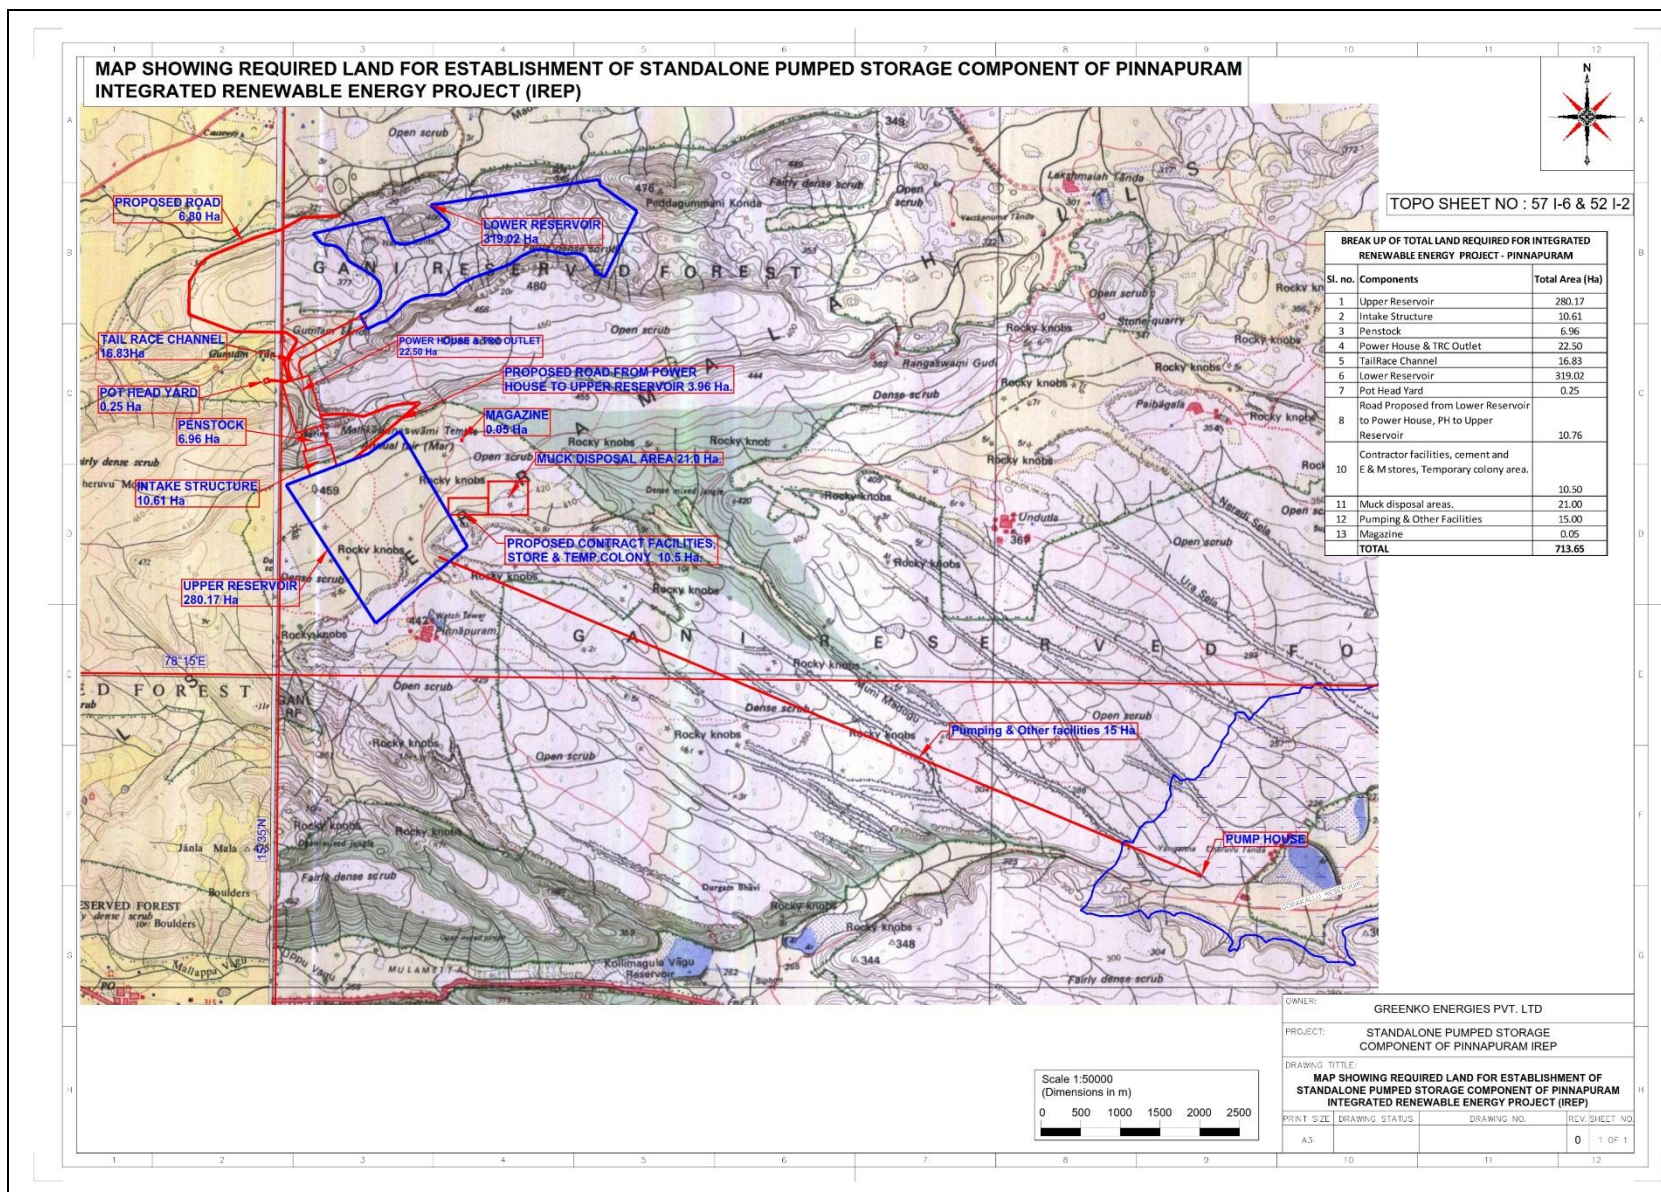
Layout Plan of Pumped Storage component of Pinnapuram IREP showing location of muck disposal site
